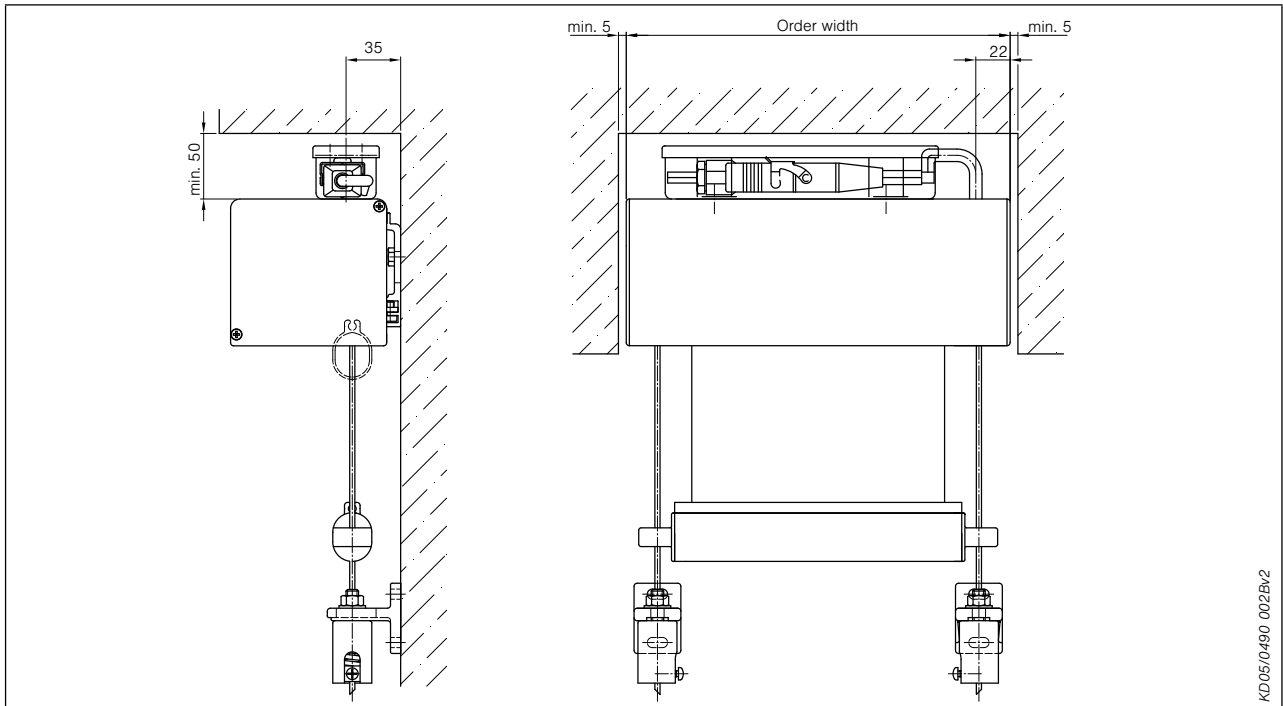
Individual unit, left rolling blind, wall installation, cable guidance with cable exit at the top
